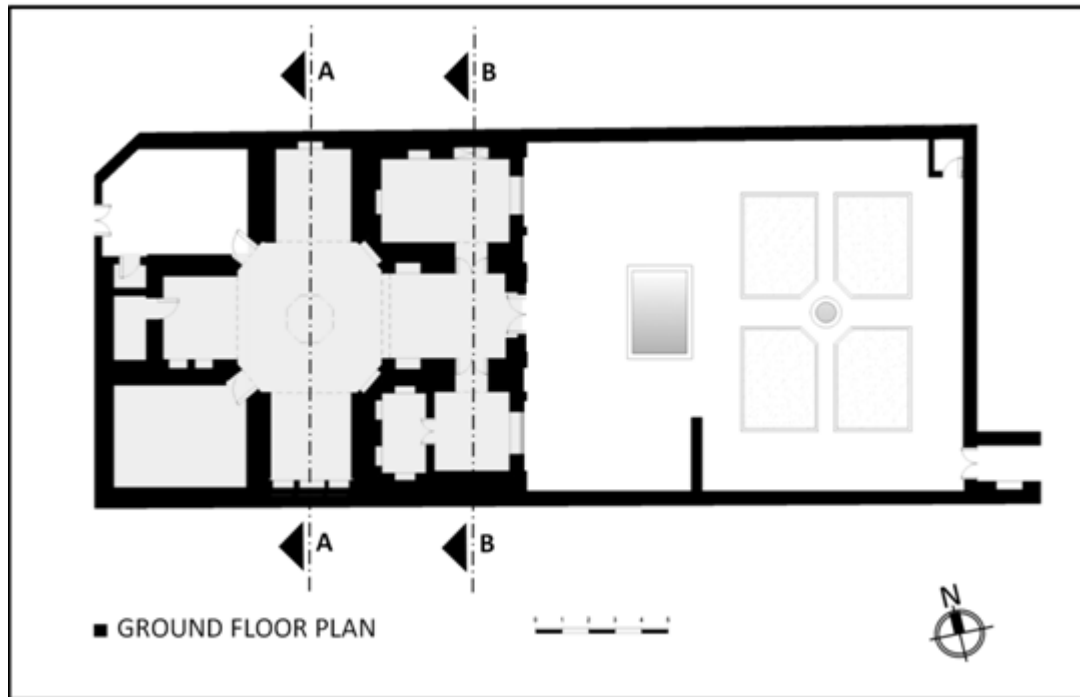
Plan of the Dareini house, source:(Estaji, 2010) and the local Archives of SCHO
